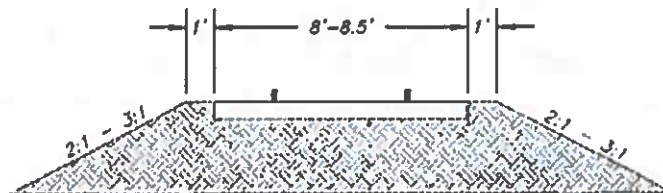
Typical Rail Bed Cross Section from MP 18.5 to MP 61
